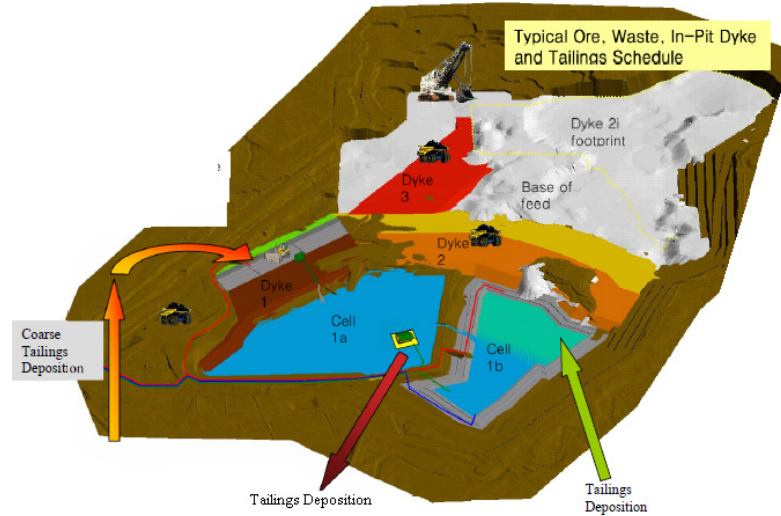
Dyke construction planning at Shell Canada Ltd. – long to medium term (Fauquier et al., 2009)
